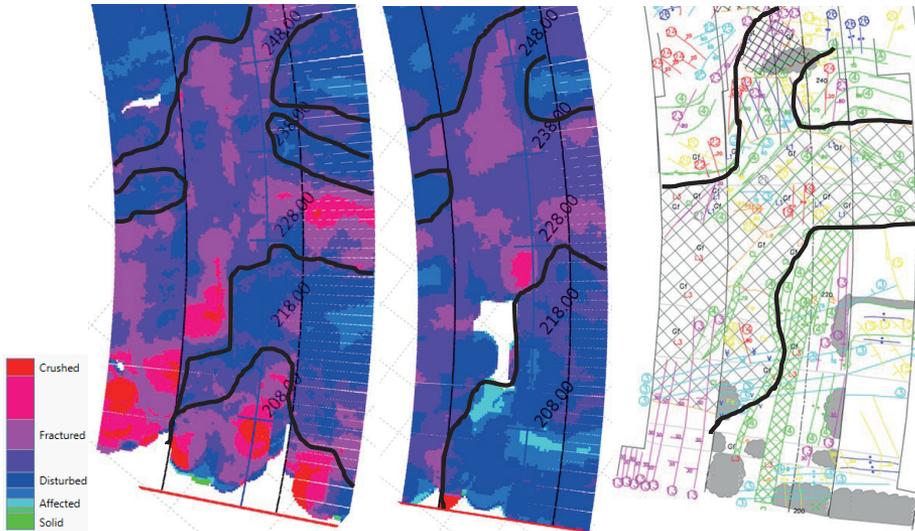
Fracture Index and geotechnical mapping for section 200 to section 250 (50m) in Tunnel 213 showing grout holes, blast holes and mapping. The black lines show the shape and orientation of the fracture zones.
